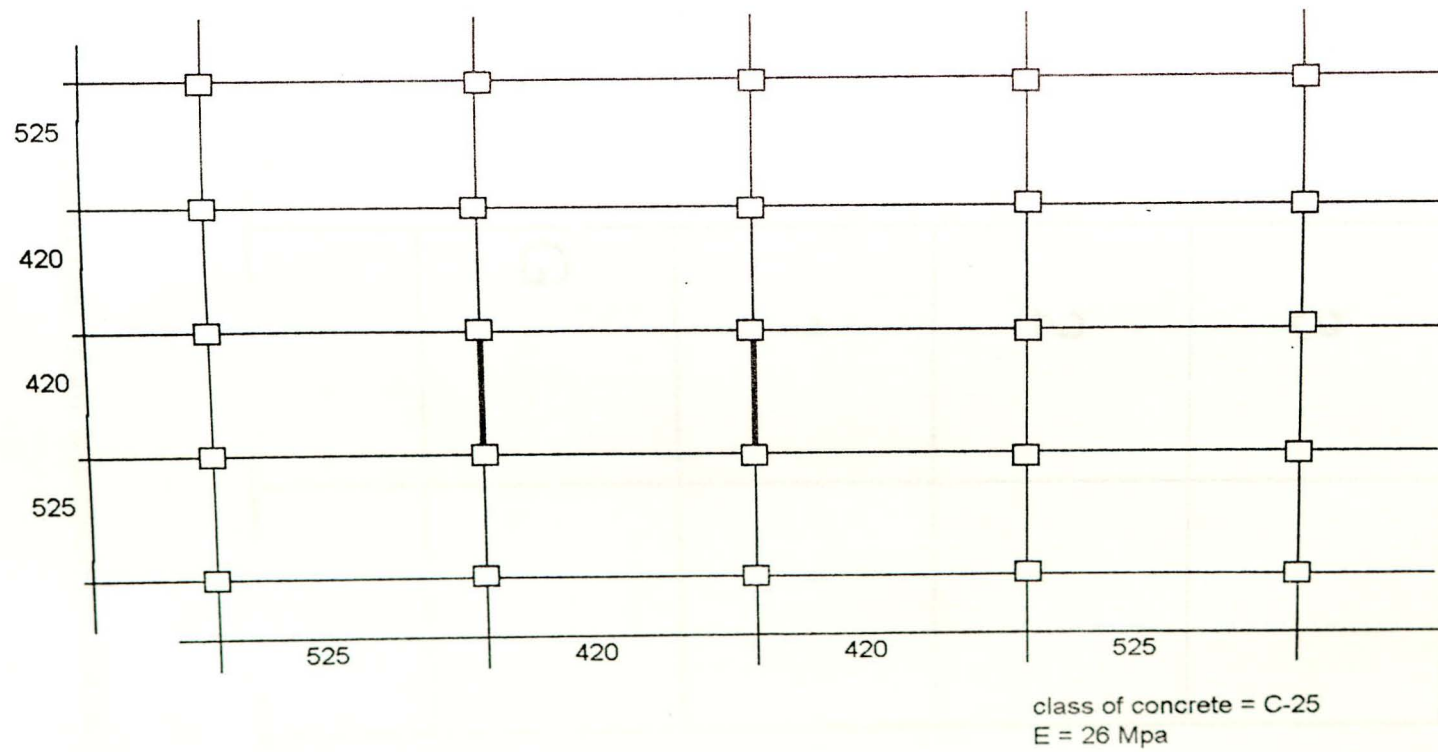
ETHIOPIAN GRAIN TRADE BUILDING FLOOR PLAN (BLOCK-B).
